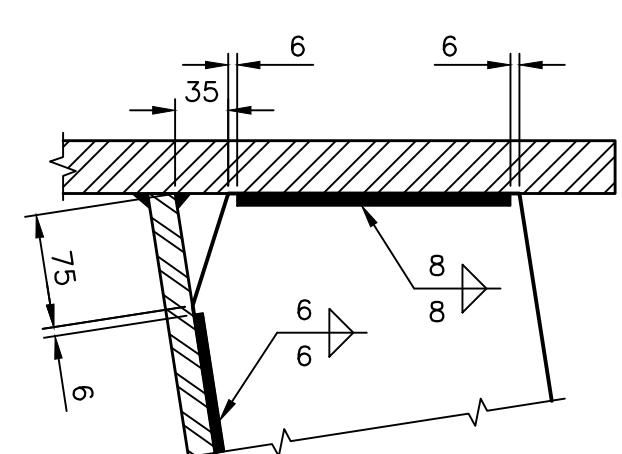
DETAIL - TYPICAL BOX GIRDER DESIGN CRITERIA 1 S3
